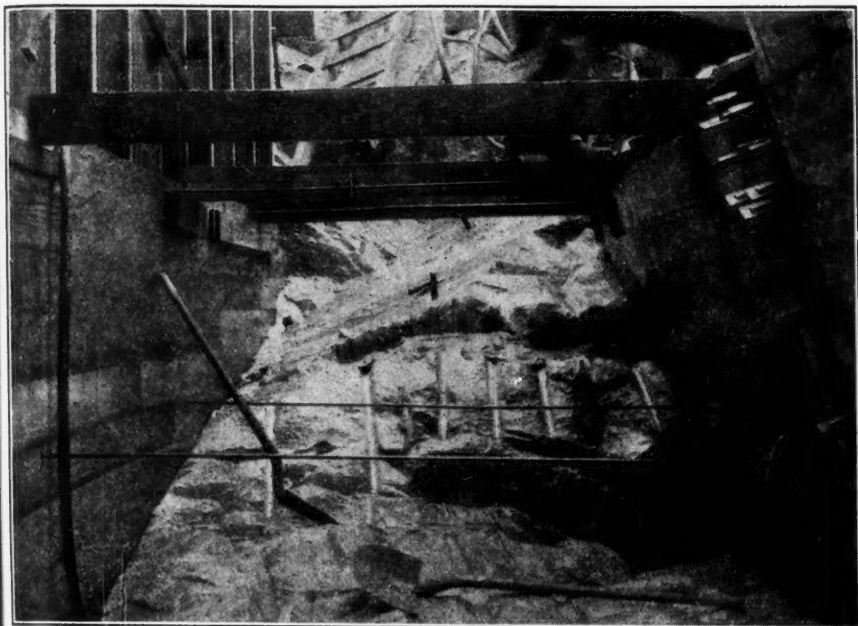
FOUNDATION ROCK AND INTERIOR OF FORMS BEFORE CONCRETING, STEVENSON CREEK TEST DAM.
